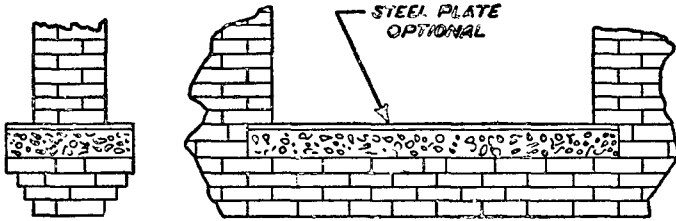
Concrete sill supported by a corbel of brick used with combustible floors.
